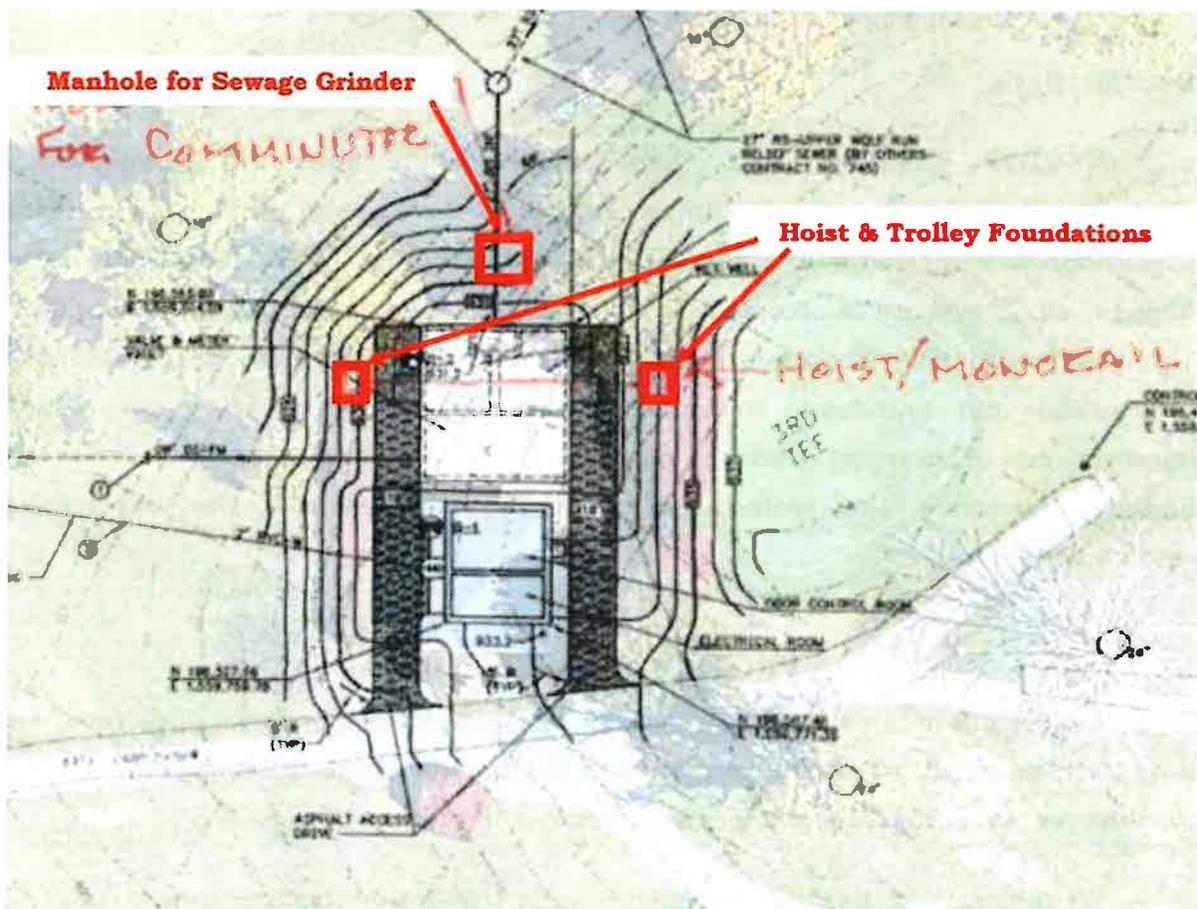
The proposed structures are located on the northwest, northeast, and southeast sides of the existing pump station.
